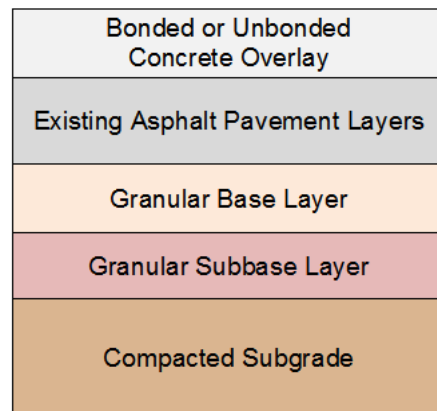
Cross sections of asphalt pavement structures rehabilitated with overlays (not to scale).
